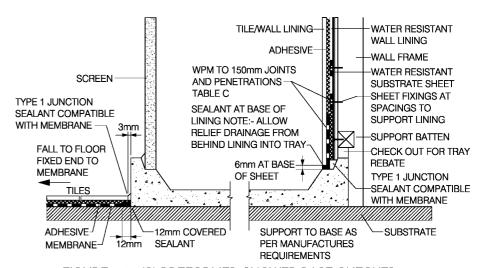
(C) PREFORMED SHOWER BASE CHECKED INTO WALL, FRAME OR RENDER
